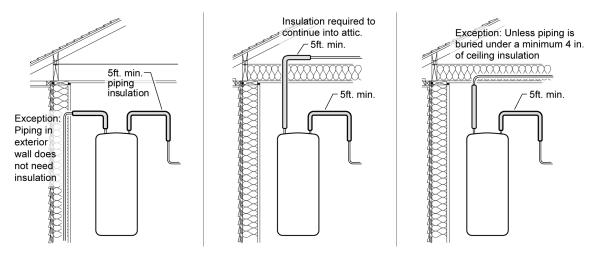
Meeting Pipe Insulation Requirements for Storage Tank Water Heaters
